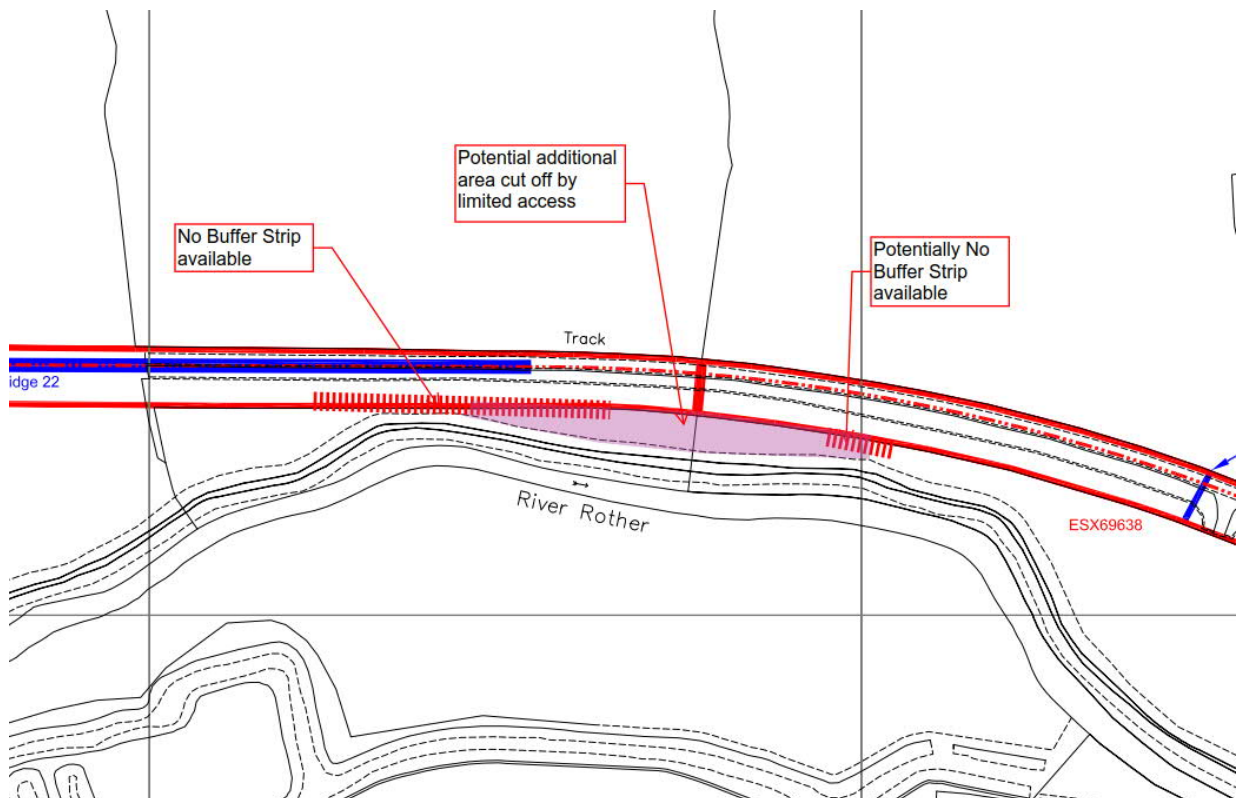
To the east of New Culvert/Bridge Structure 22
